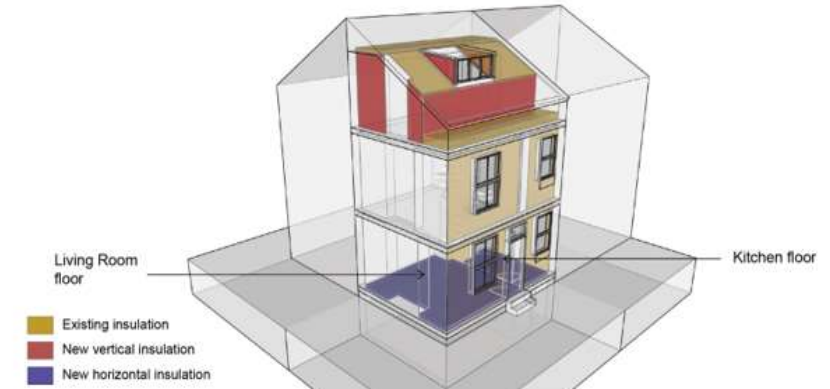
Stage 3: Floor retrofit to Kitchen and Living Room, (17BG.A.R.F)
